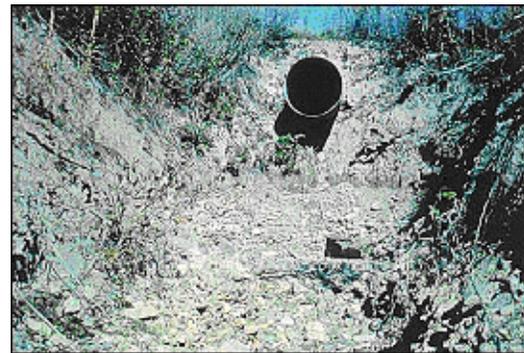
Culvert Not Installed at the Existing Stream Gradient
